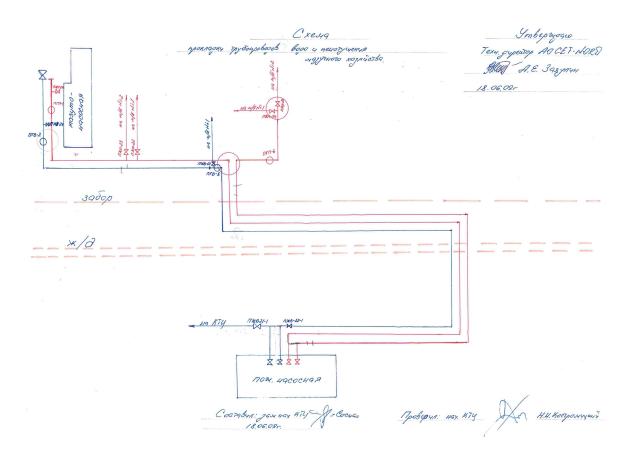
Technological scheme of the mazut facility's fire extinguishing system
